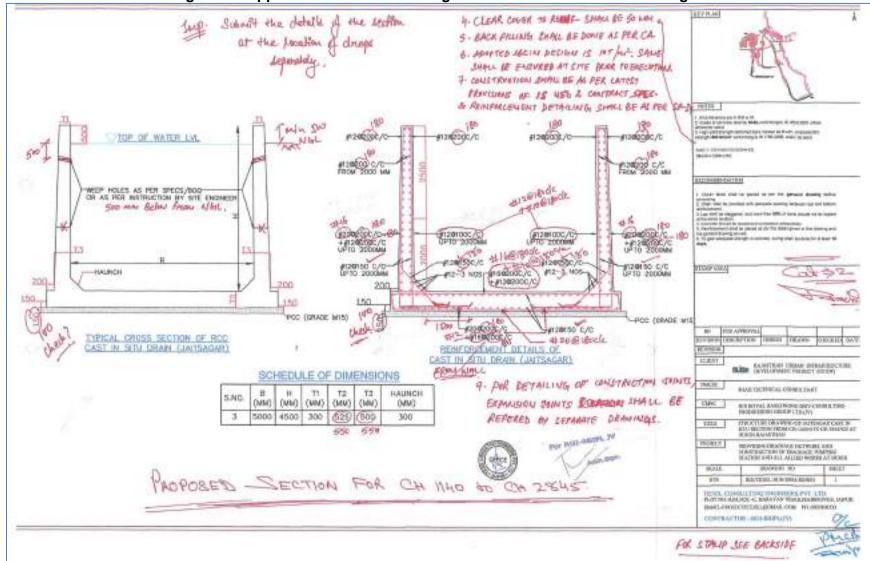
Approved Structural Drawing of Cast in Situ Section of Jait Sagar
